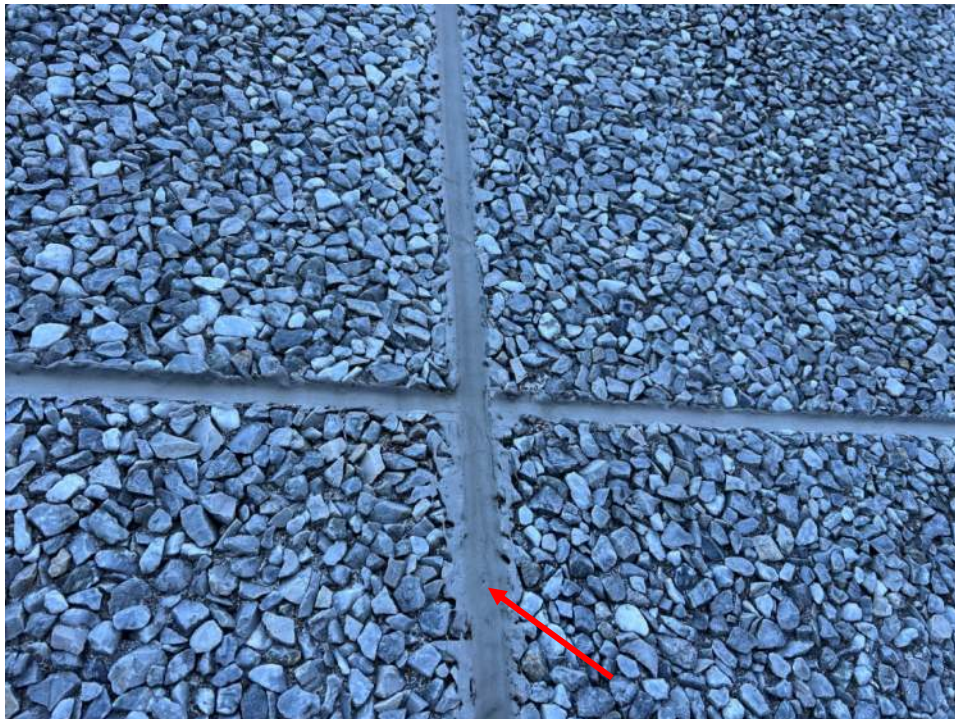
Typical view of localized precast panel joints crazing, and cohesive failures (red arrow)
